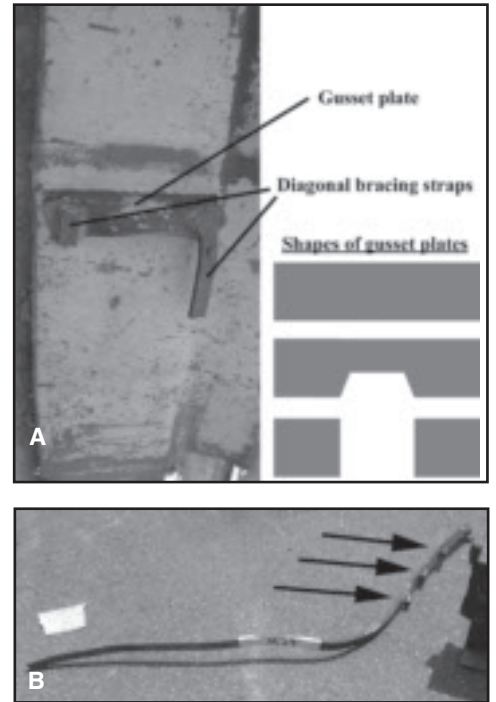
Example of a strap connection from a recovered exterior panel (A115 : 89–92). A — Recovered gusset plate, from column 116 at the 90th floor, and observed variations; B — portion of a diagonal bracing strap with shear studs (arrows).
